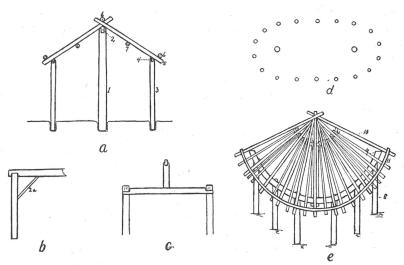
Details of house frames in Tahiti: a, framework of the fare hau pape: 1, end post; 2, ridgepole; 3, side post; 4, plate; 5, rafter; 6, upper ridgepole and eaves batten; 7, purlin; b, joining of ridgepole and end post with oblique brace (a, 2); c, kingpost supported by beam; d-e, ground plan and frame of fare potee; 8, end post; 9, curb plate; 10, rafter; 11, curved purlin.
